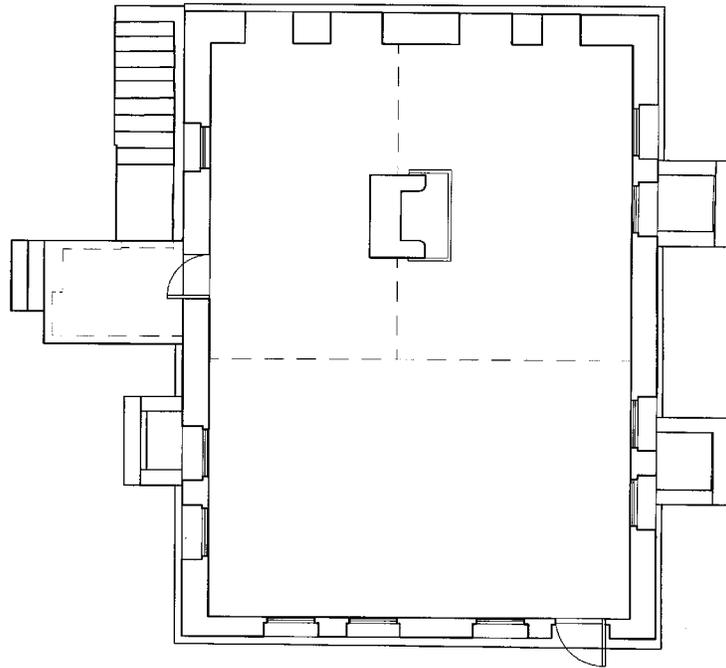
A possible original plan configuration, showing original porch and general room divisions. Note that modern interior perimeter walls are absent. North is at bottom. (Drawing by the author)
